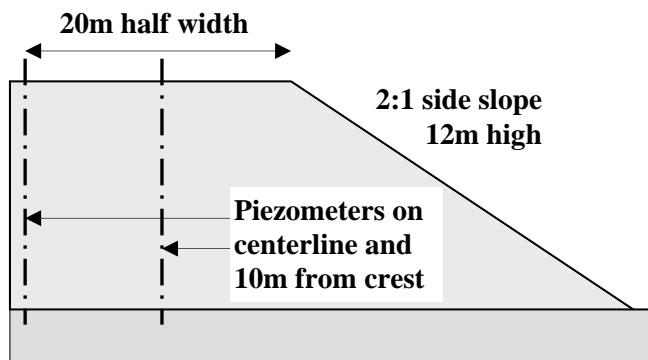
Section through London Clay highway embankment after Farrar (1978)
